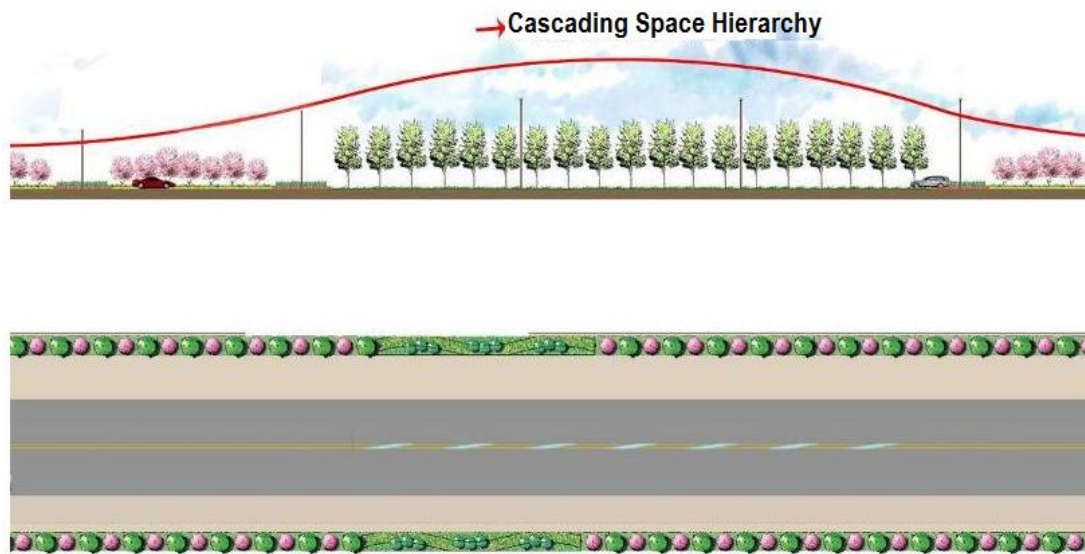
Standard Demonstration Section of North and South Binhe Road Landscaping Works
